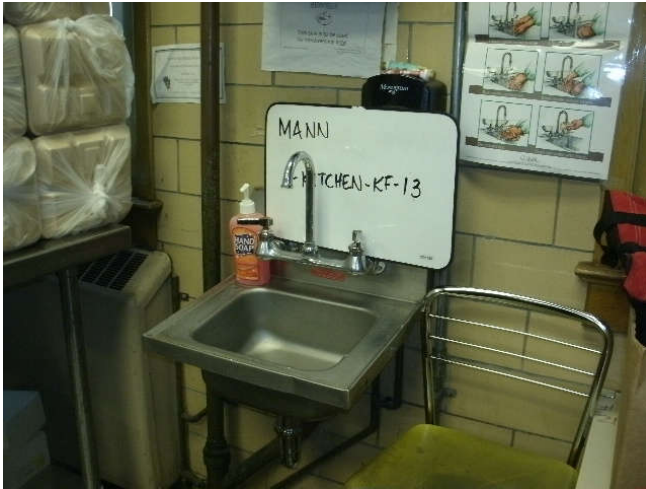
Kitchen faucet, located on the 1st floor, in the kitchen (hand washing).
